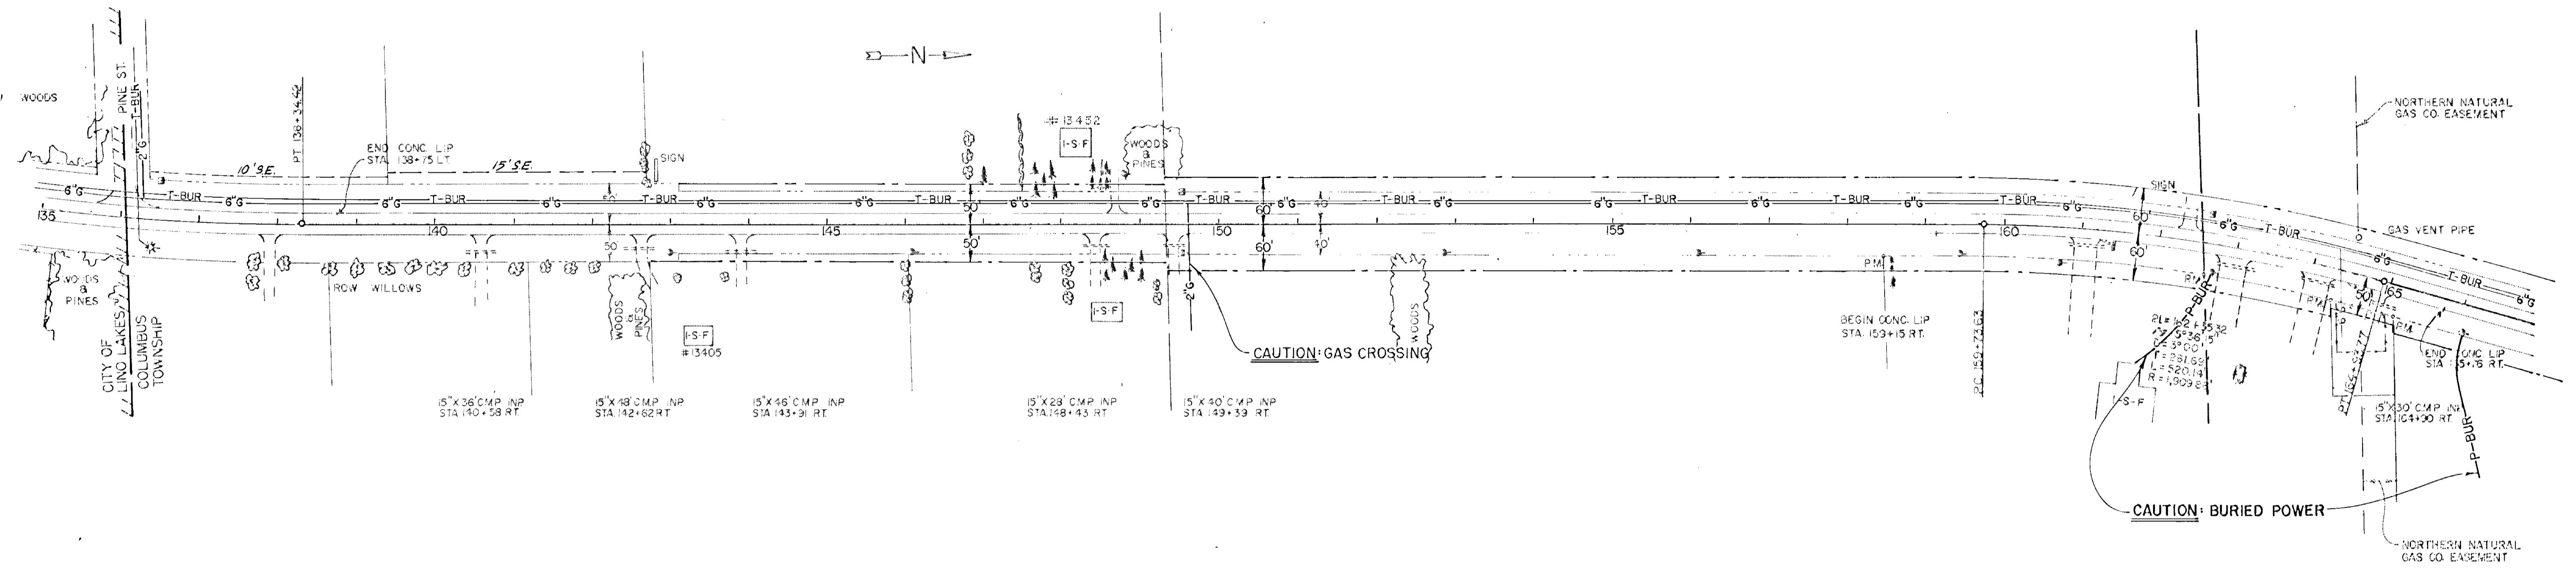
SINGLE PLAN AND PROFILE LINES DOT
